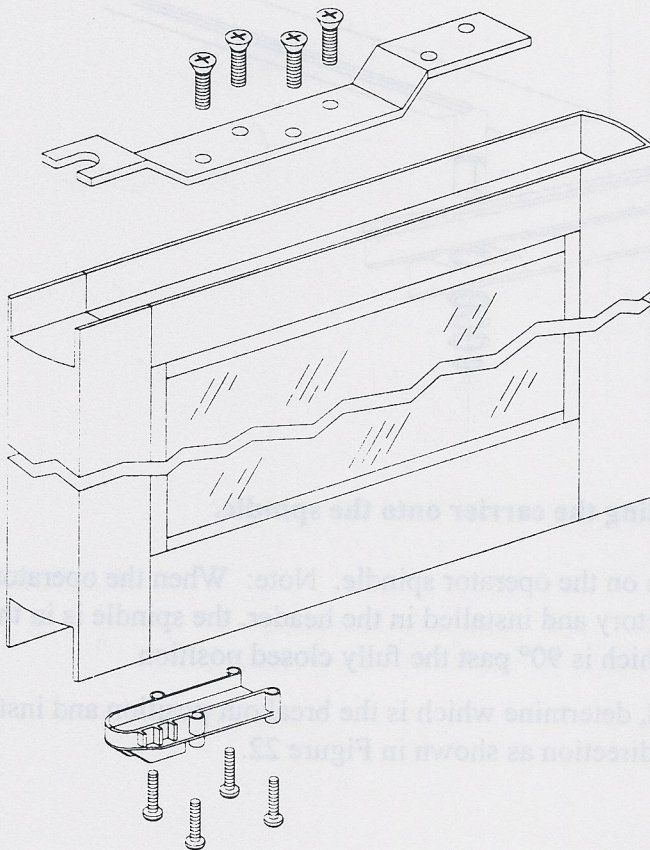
Installing the top arm and bottom pivot receiver on the door.
